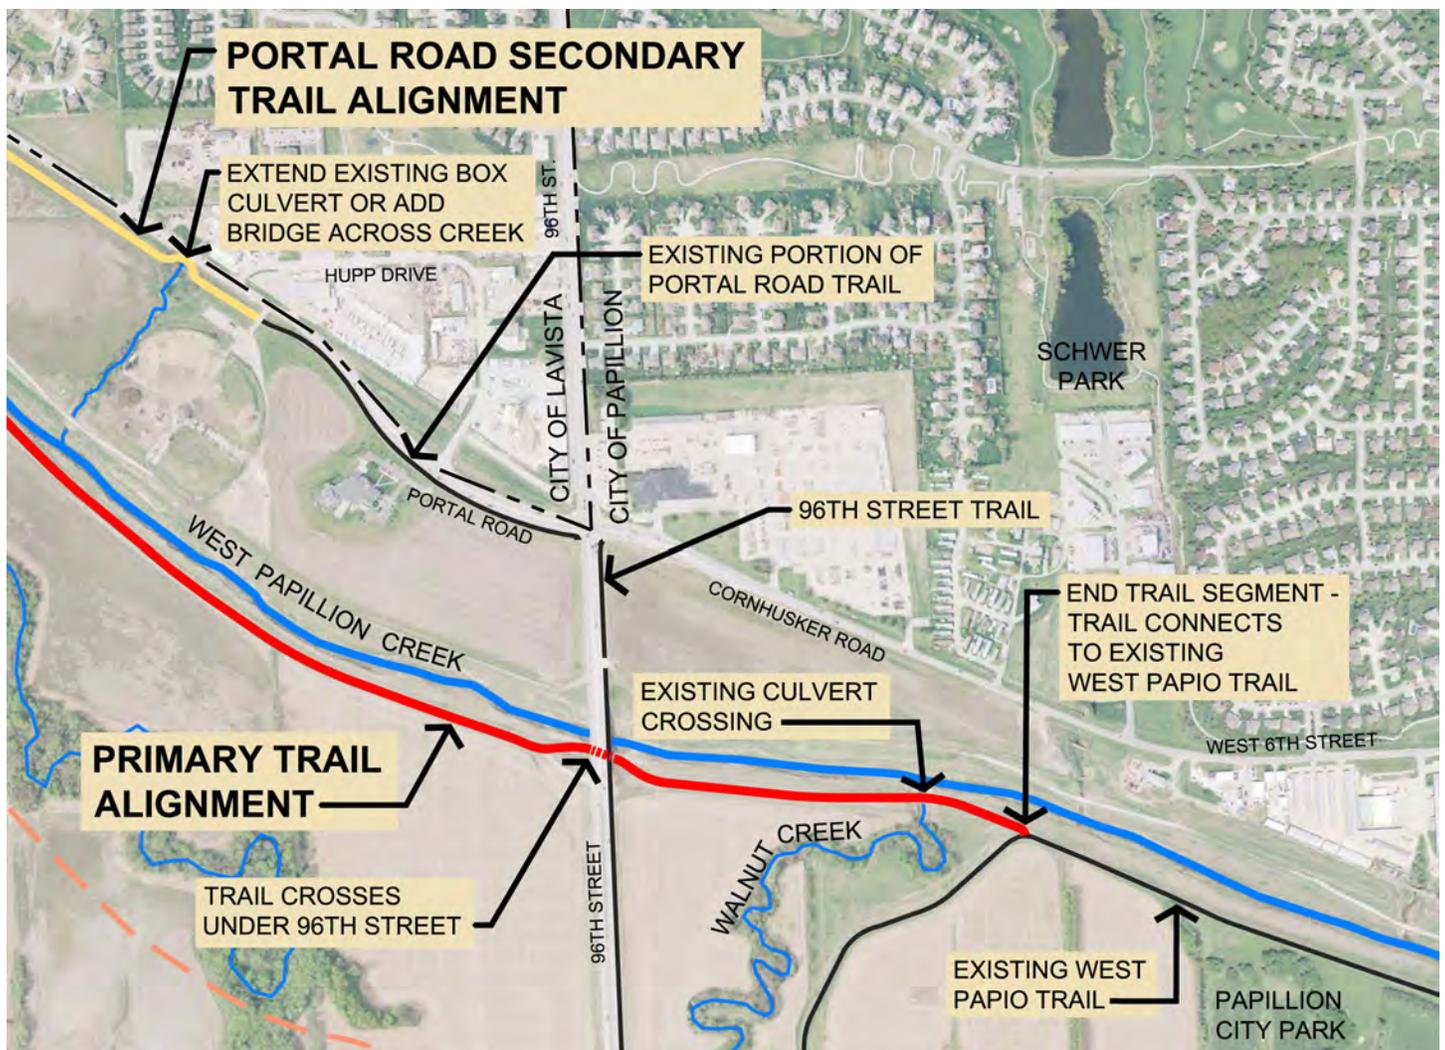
Giles Road to Harrison Street - 101st Street to Southern Section of West Papiro Trail, Primary and Secondary Trail Alignments
